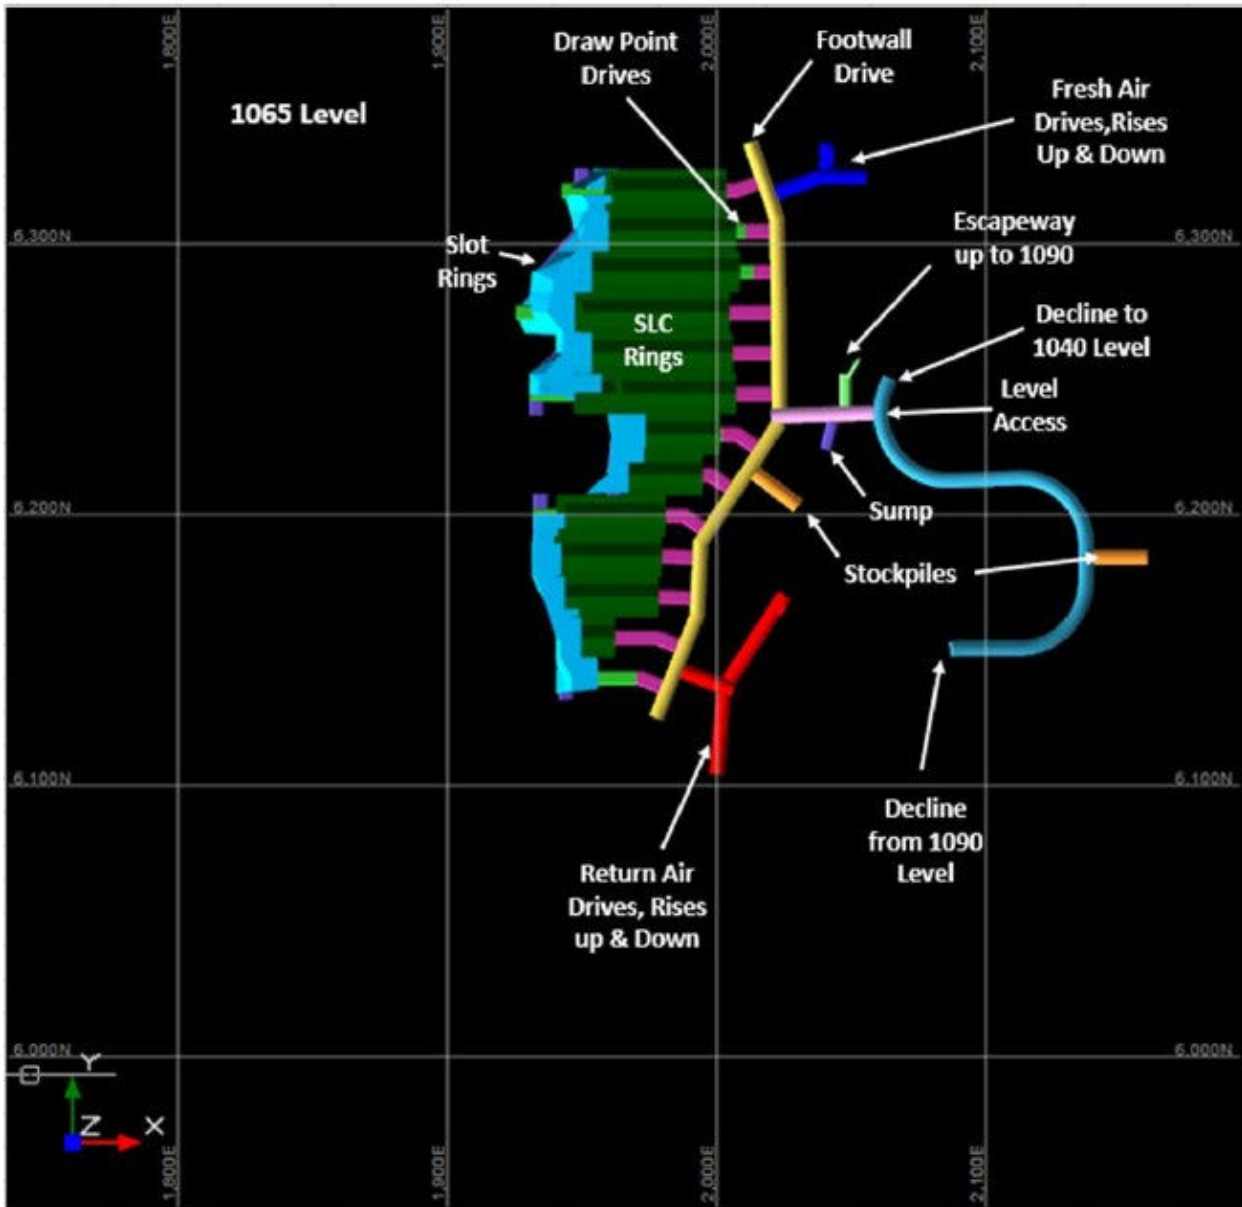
Plan view of the ESS underground design on the 1065 level
